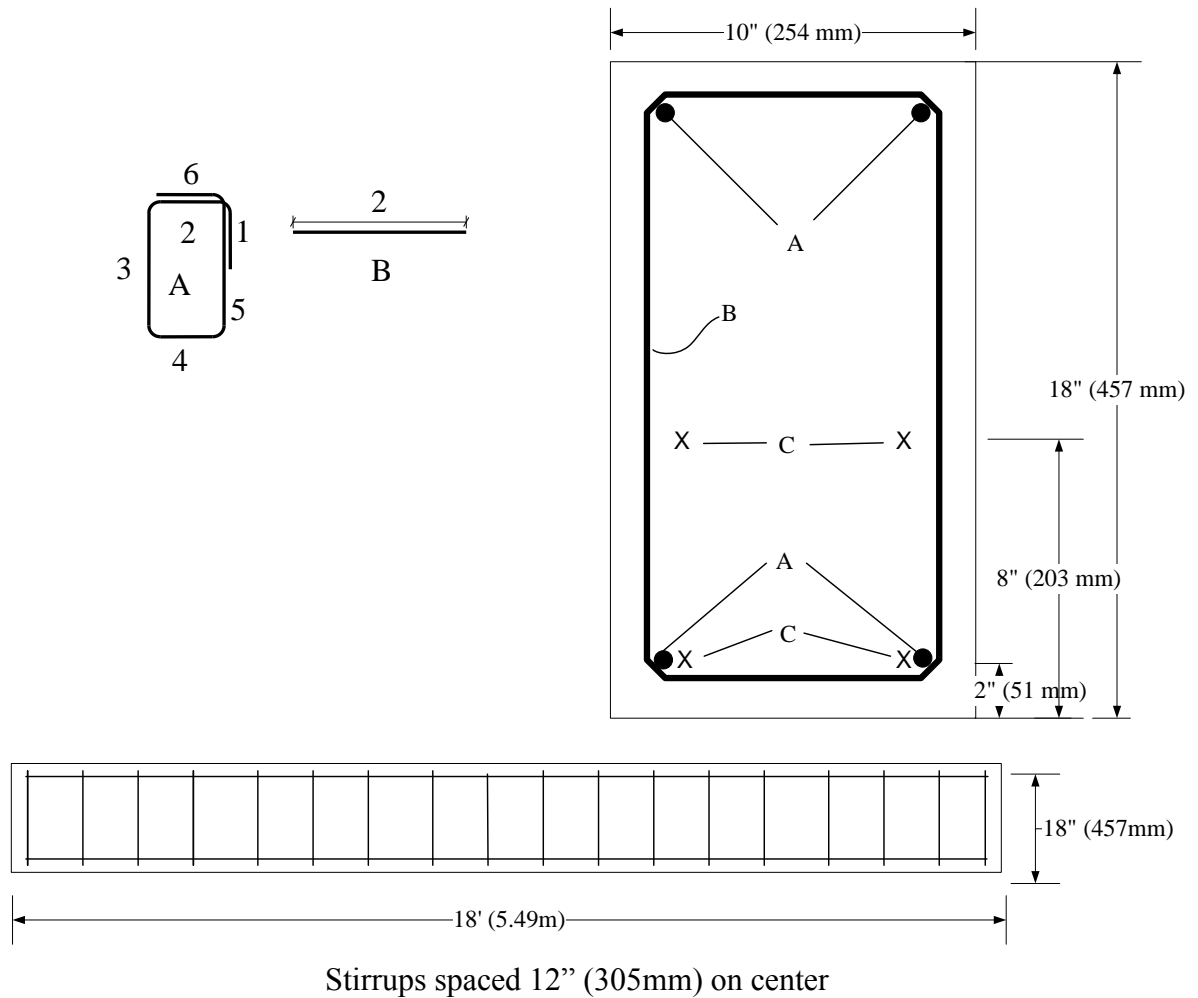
Reinforcing steel placement and beam cross section for prestressed beams.
